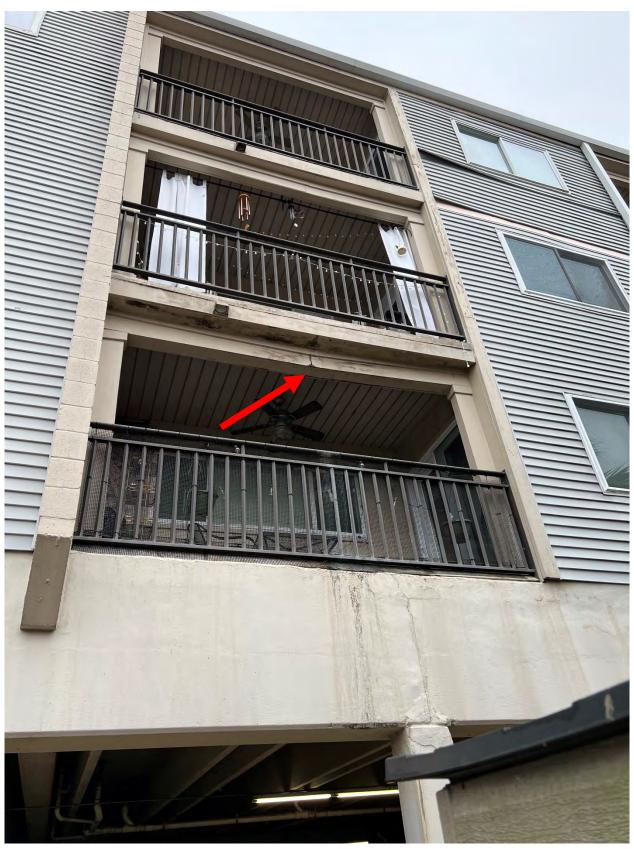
View of partial balcony failure exhibiting noticeable deflection and water damage.
